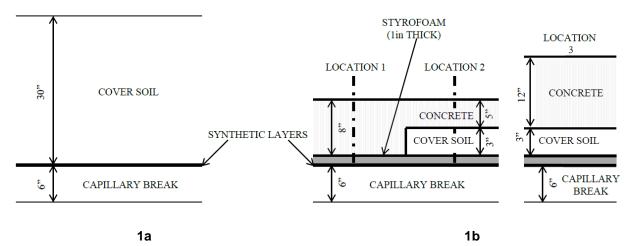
and 1b - (a) Existing Conditions, (b) Future Slab-on-Grade
